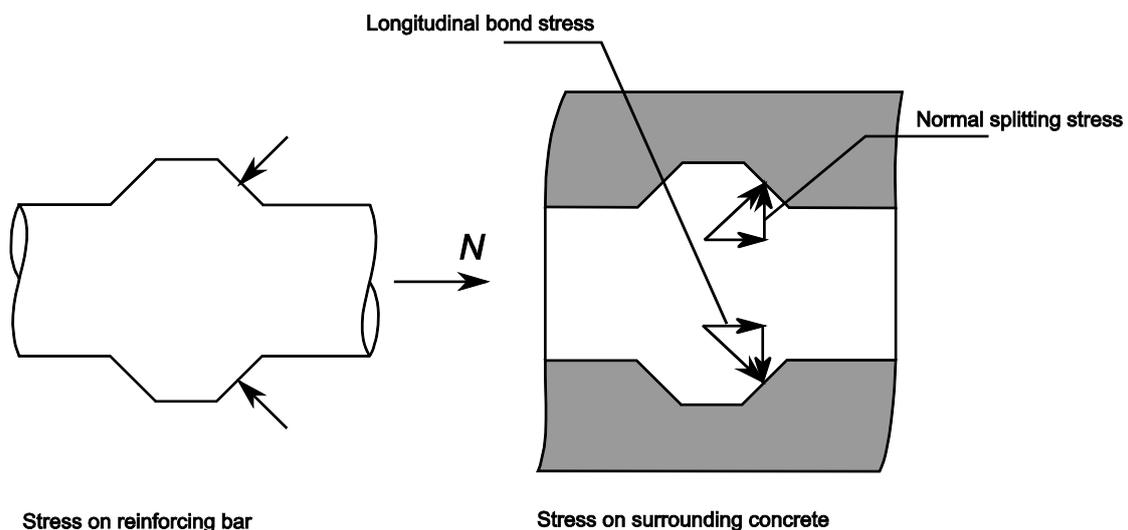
Bond between a ribbed bar and the surrounding concrete by mechanical interlocking, as modified from Magnusson (2000).
